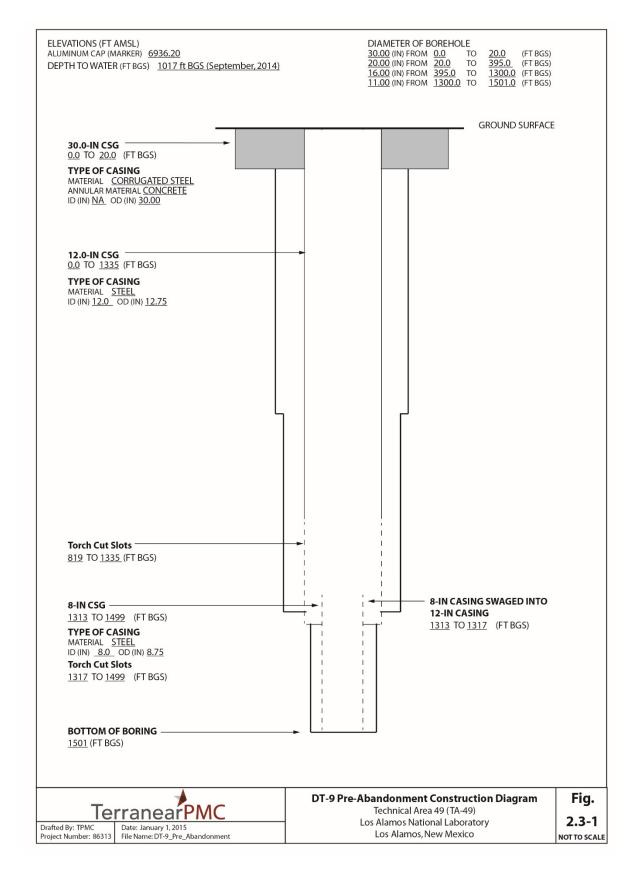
Test well DT-9 pre-abandonment construction diagram
